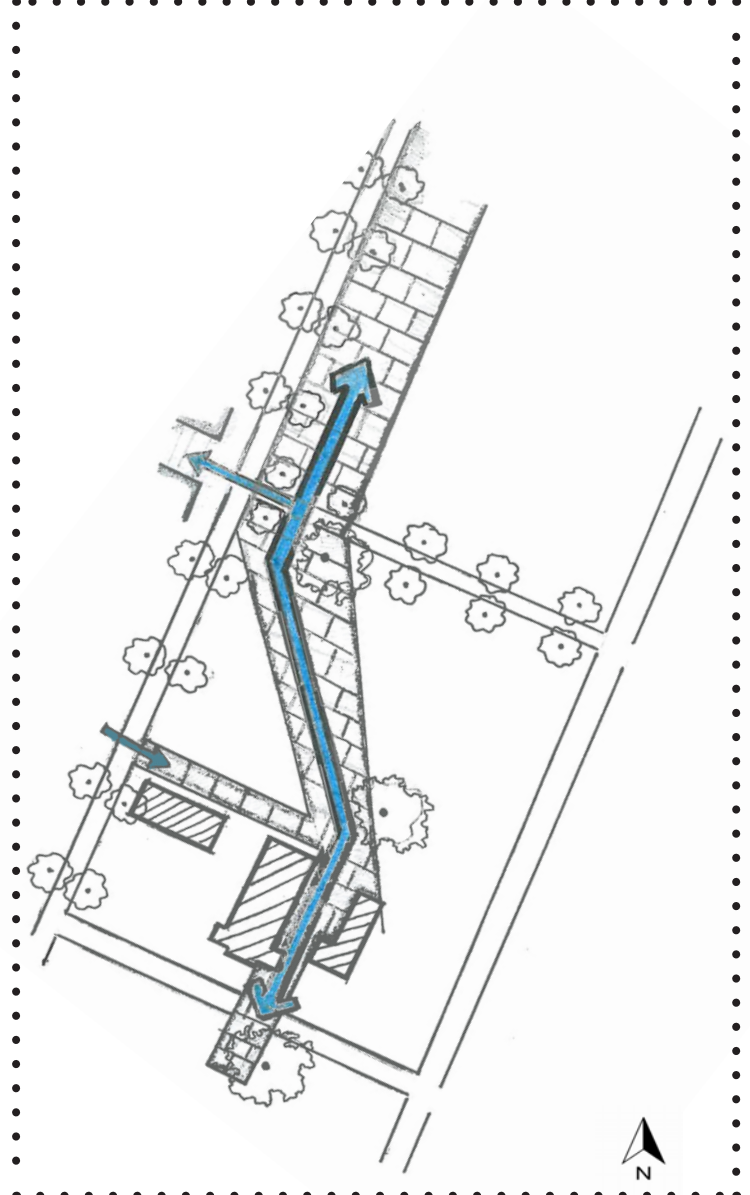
Master plan concept diagram showing urban corridor that links the site to its surroundings(Author,2017).
